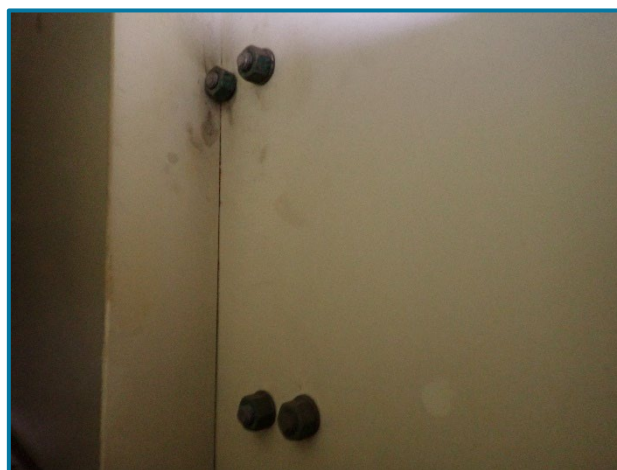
Typical bolted drainpipe support bracket connection (looking north on the interior of Pier Cap 12A).
